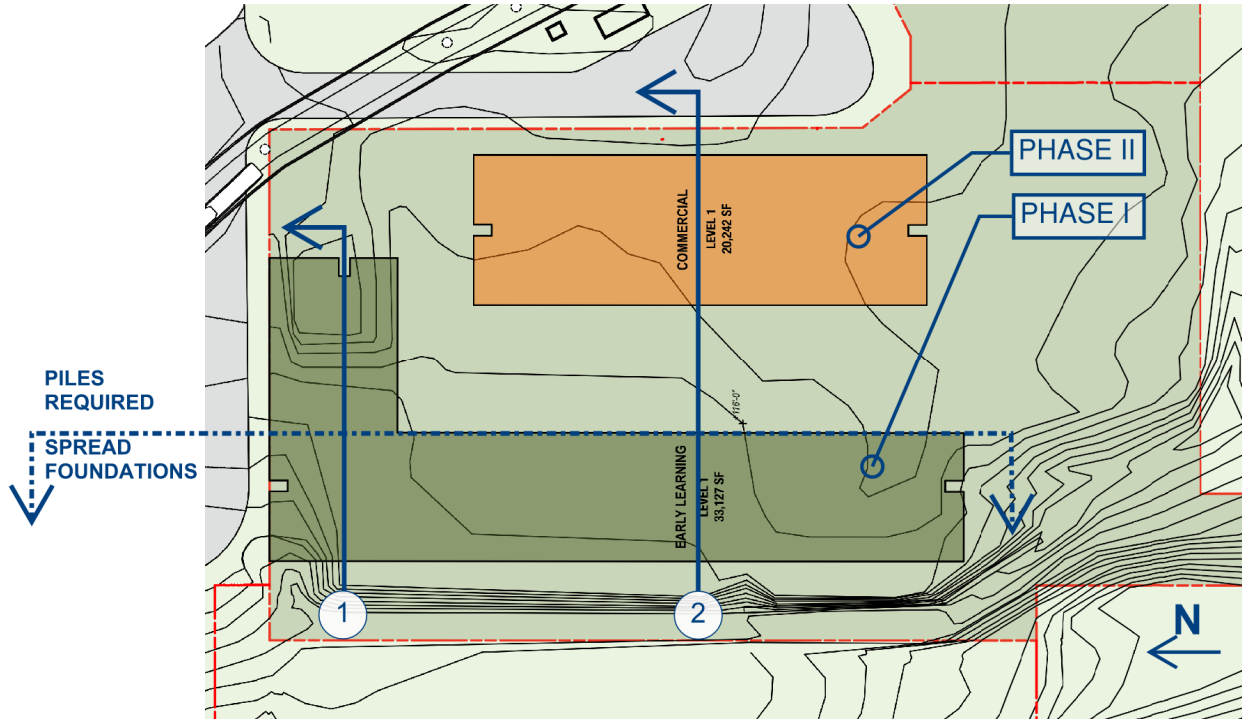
SPUDS Concept 1 Level 1 Plan
